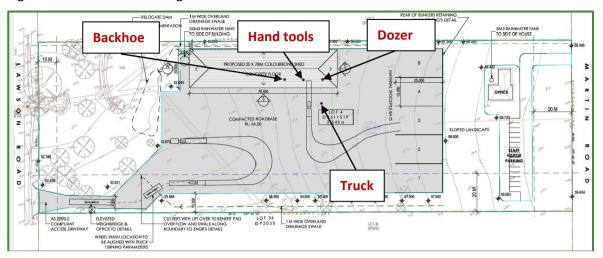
Construction Stage 2 – Concreting Construction Works
